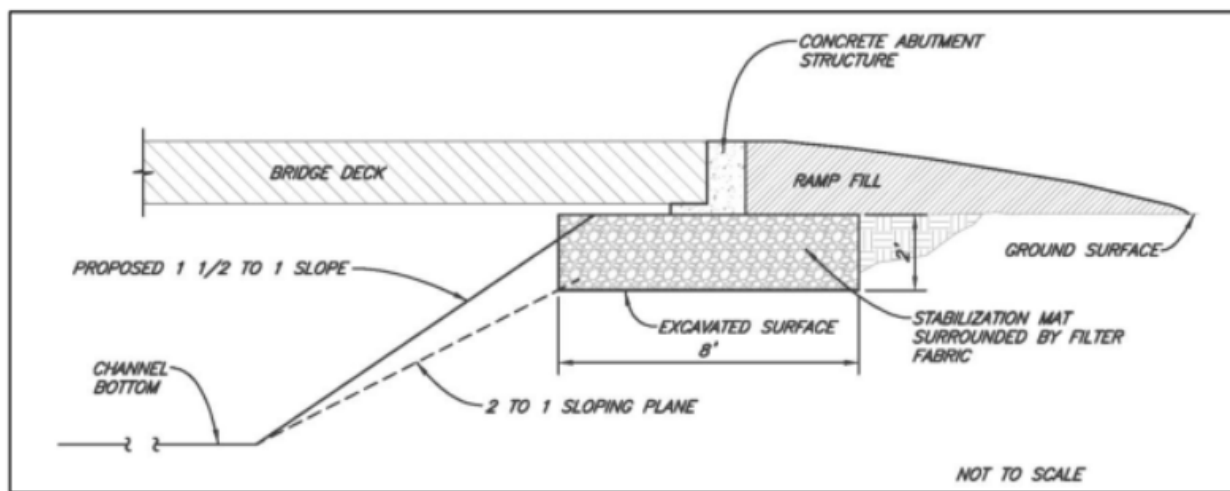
Schematic drawing of a foundation system for bridges, SHN (2020).
